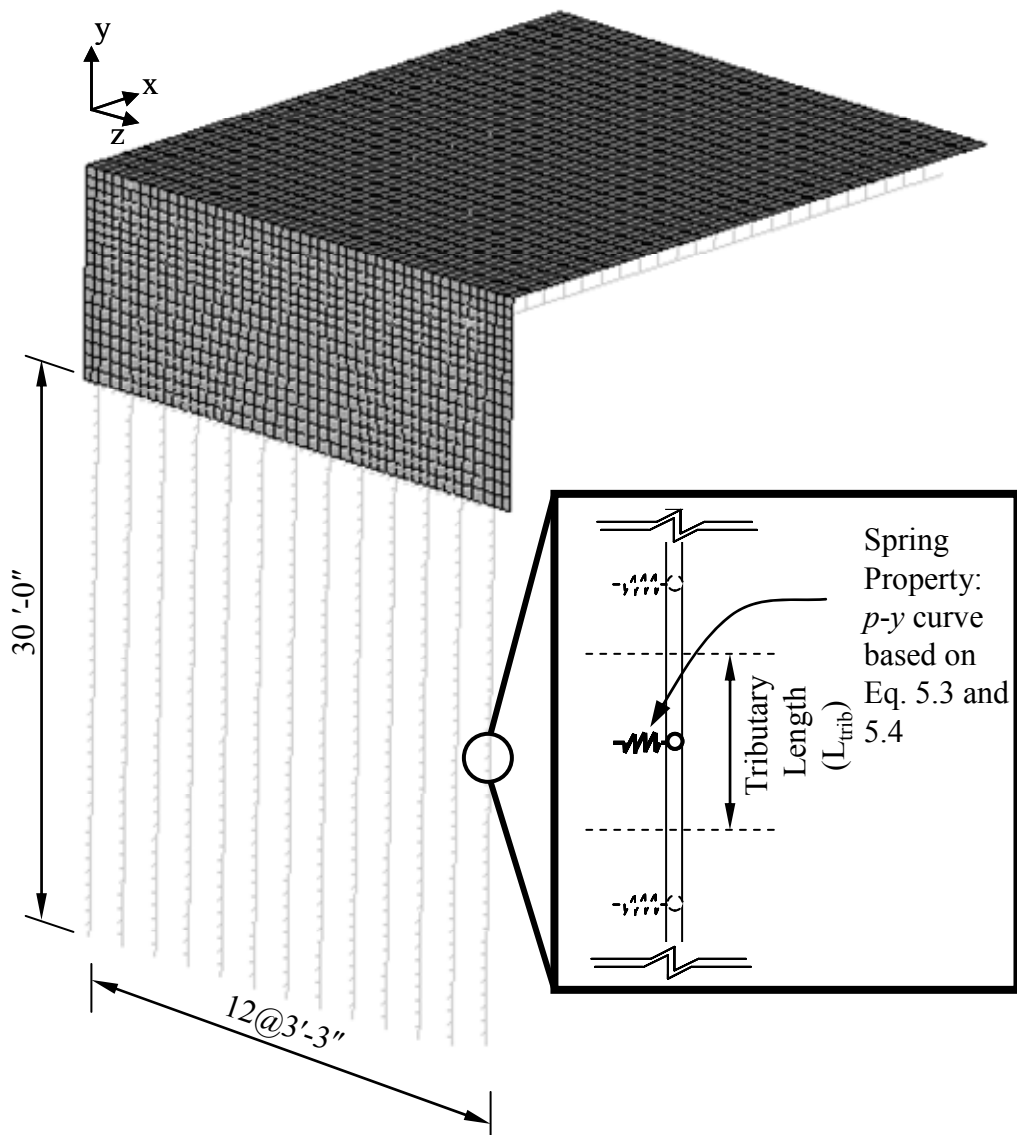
Foundation Pile Section Soil Spring Definition.
